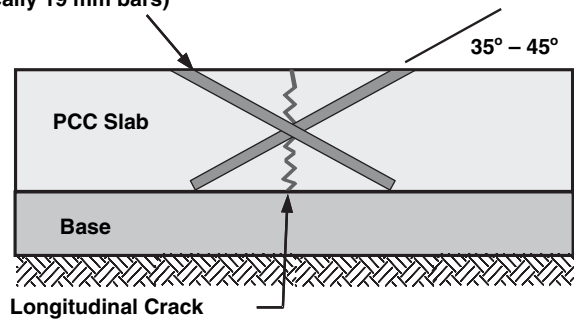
Cross-stitching of longitudinal crack (Hoerner et al. 2001).
